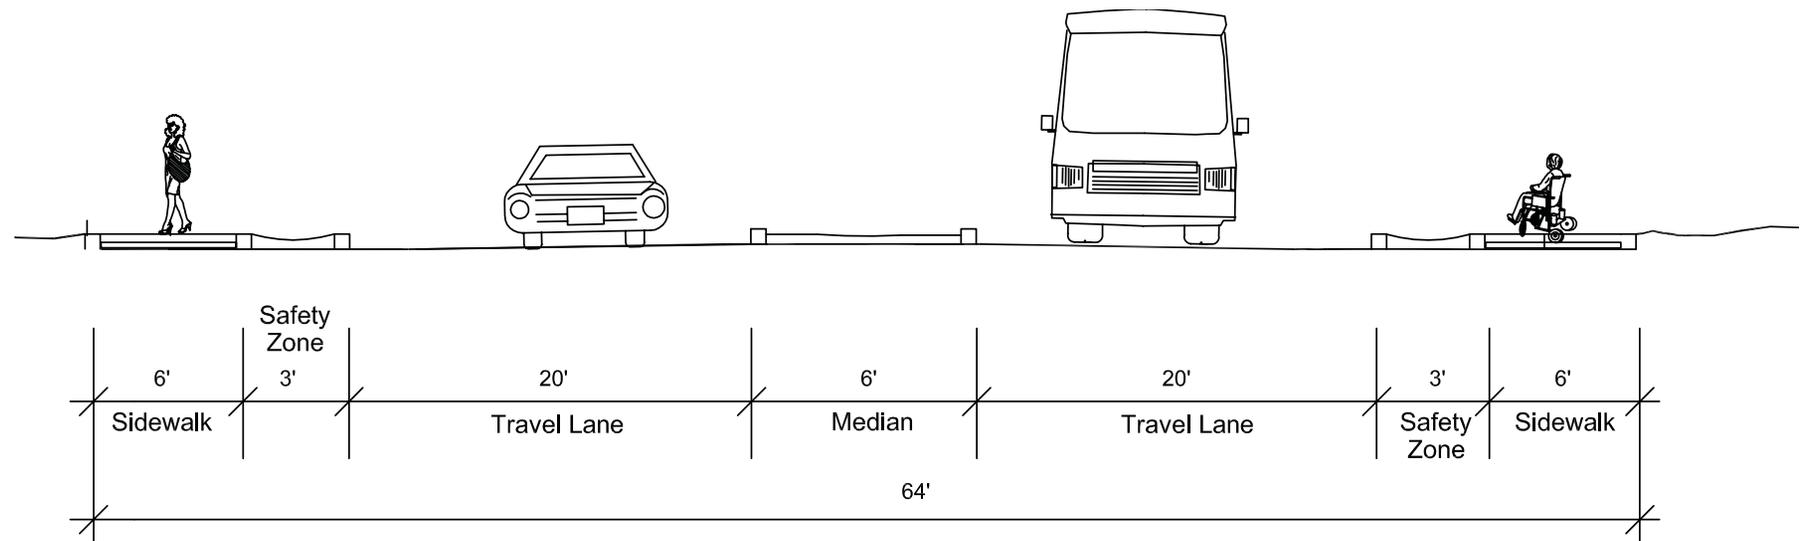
E - Street Section: Towner Loop Adjacent to Whitmore Elementary School
